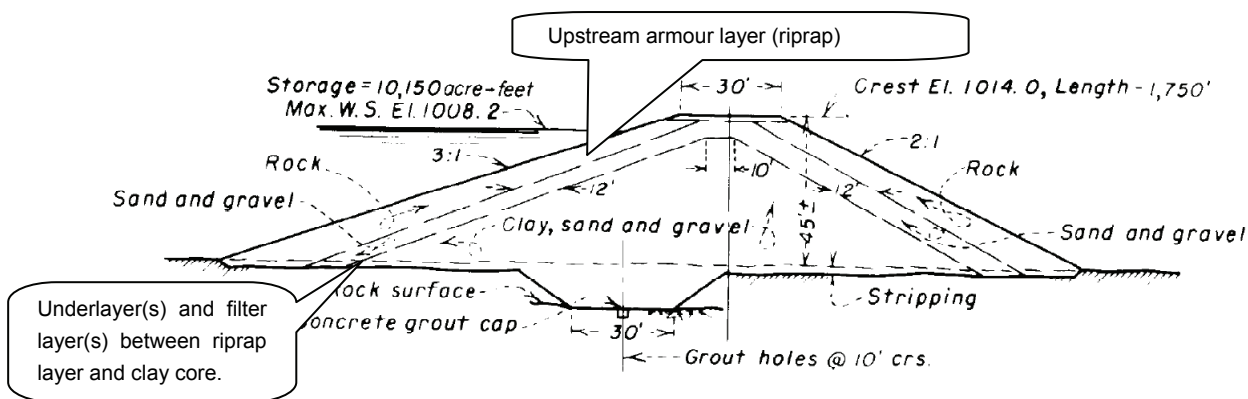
Typical dam cross-section indicating riprap layer (armour) relating to the underlayer
